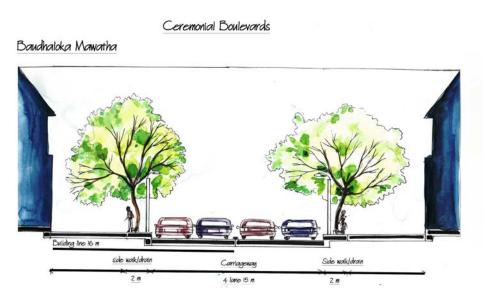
Road Cross Section of a Proposed Ceremonial Boulevard
